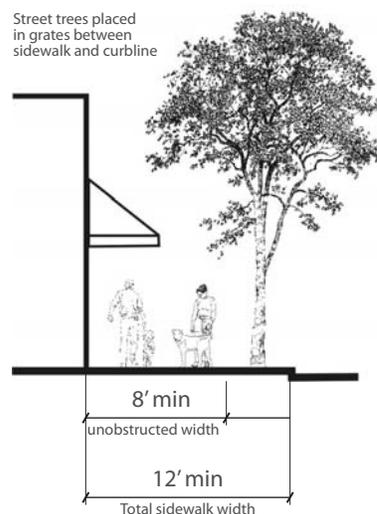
Cross-section of minimum sidewalk dimensions with trees in grates along curb edge.
